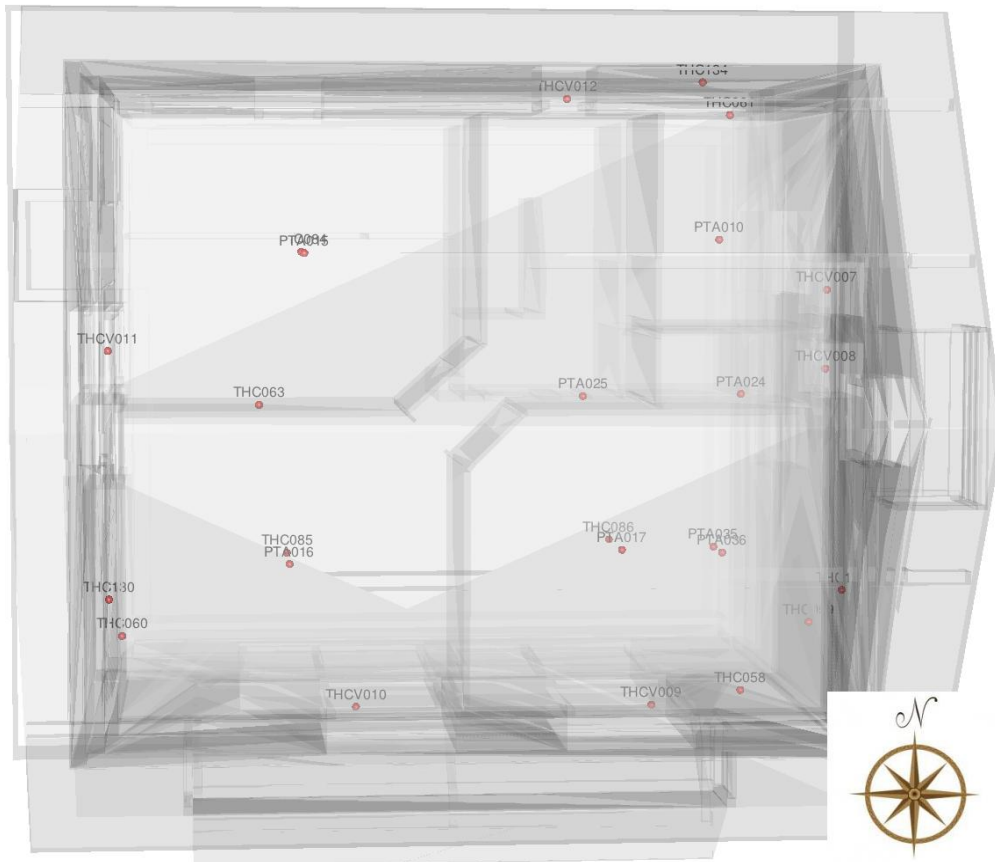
Experimental house from the INCAS platform. Upside view. Bottom of the image is south-oriented. Sensors are all located at the first floor of the building.
